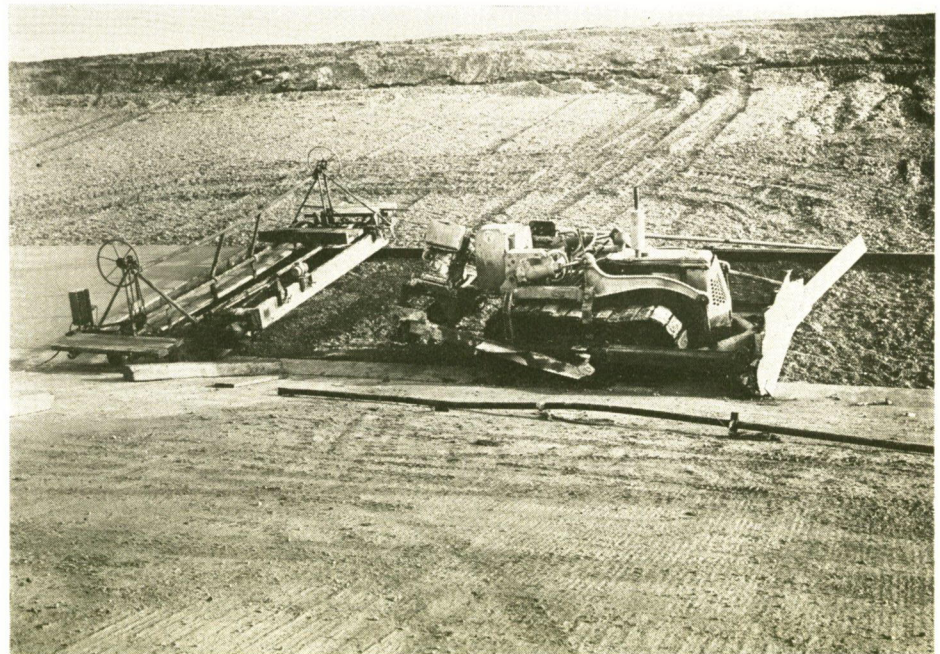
Bank slabbing machine placing 100mm concrete slabbing on interior 1 in 6 and 1 in 20 slopes
